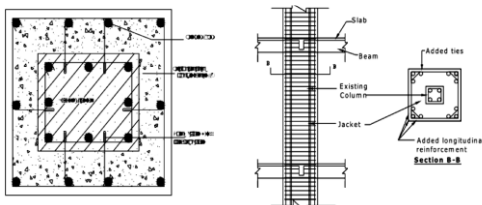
(a): Construction Technique for Column Jacketing [4]
